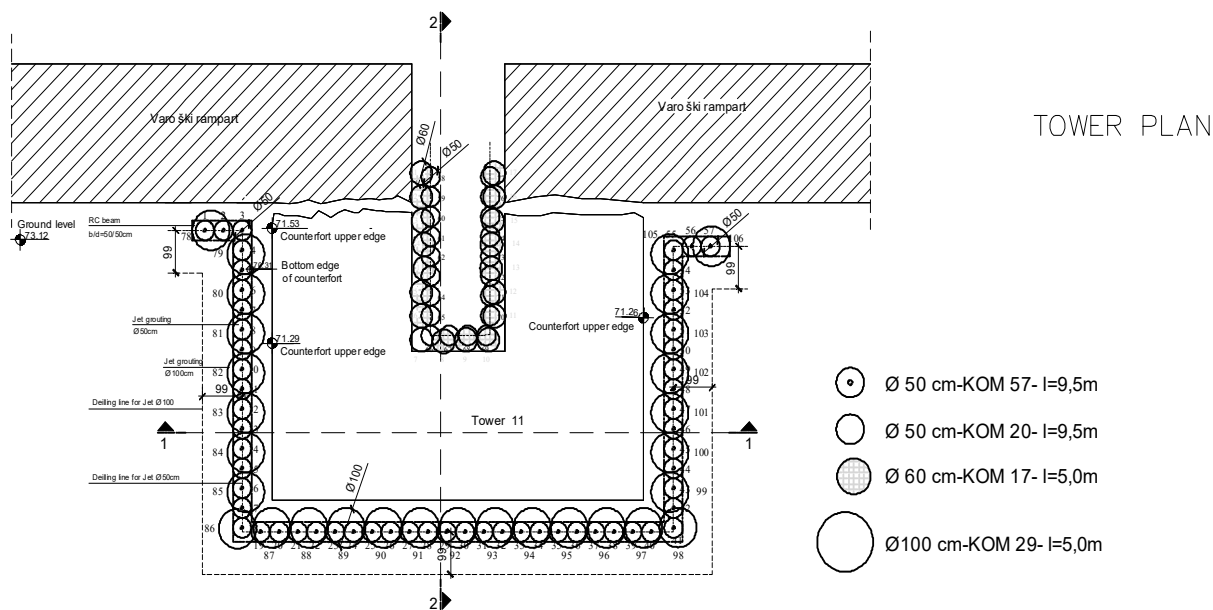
Rehabilitation plan for Tower 11 foundations using jet grouting
